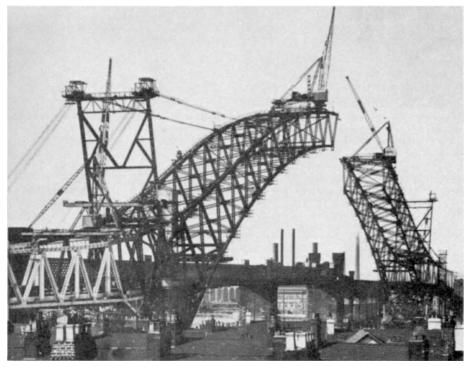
In the erection of an arch bridge, temporary supports are required to assist in cantilevering the two halves of the arch out from the abutments. Transient loads, deformations and stress reversals which occur during the erection process must all be
